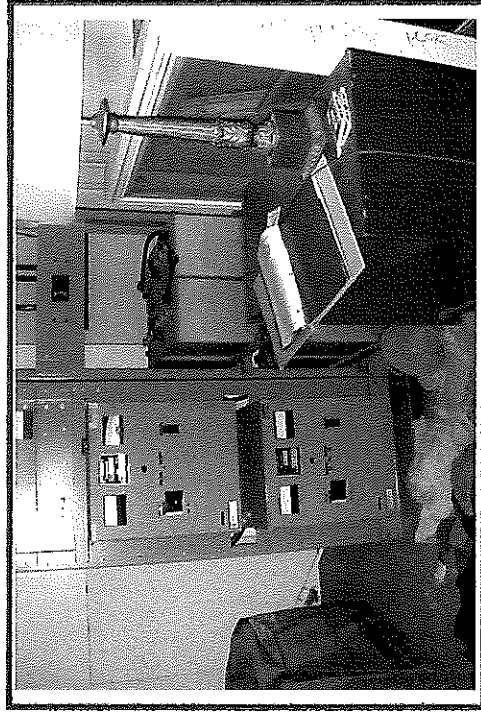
Telecommunications equipment with batteries in the Wilson Building.
